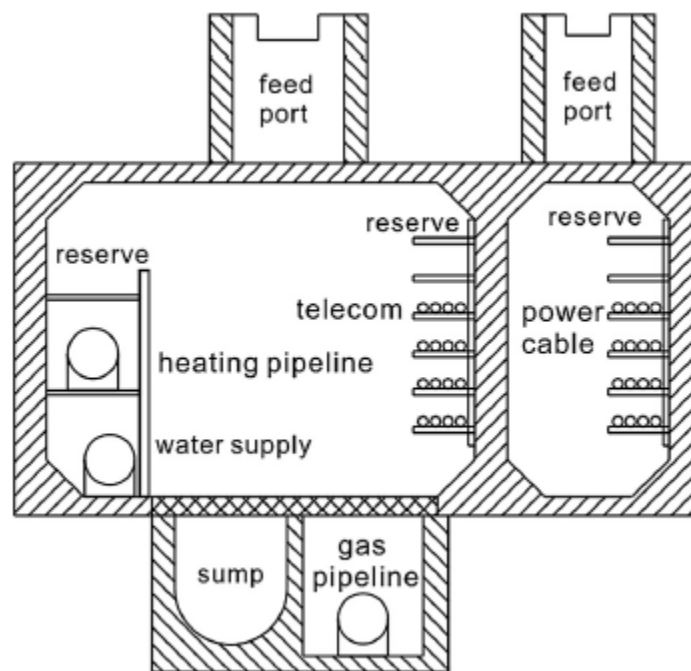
Layout of utility tunnel in Baiyin city (Wang, T, 2020)
